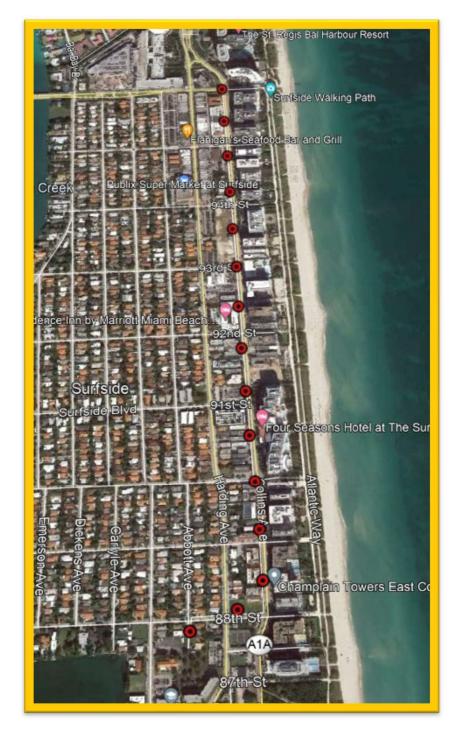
COLLINS AVENUE PROPOSED BORING LOCATIONS
